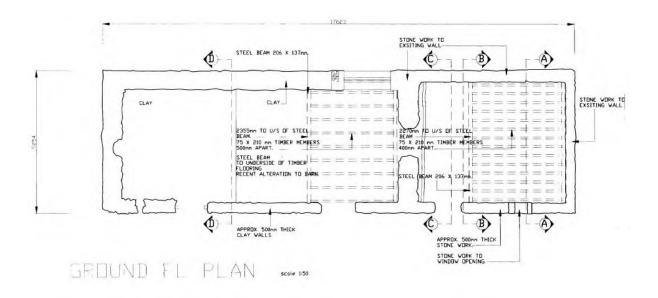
Ground floor survey drawing, western end (right hand side) is sand stone construction.
